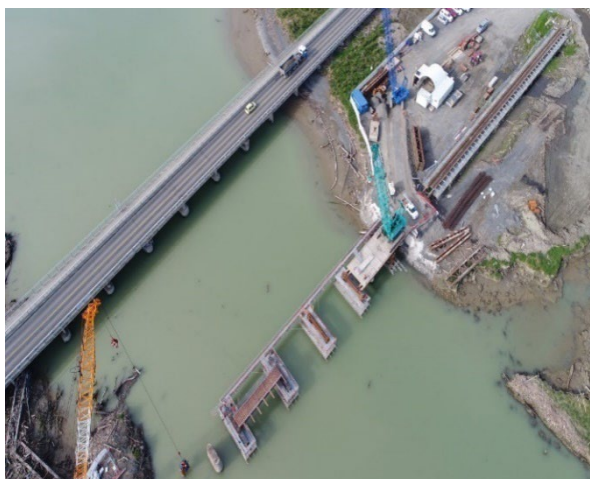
Construction of temporary bridge for Bridge 217 PNGL (Source: TREC)
